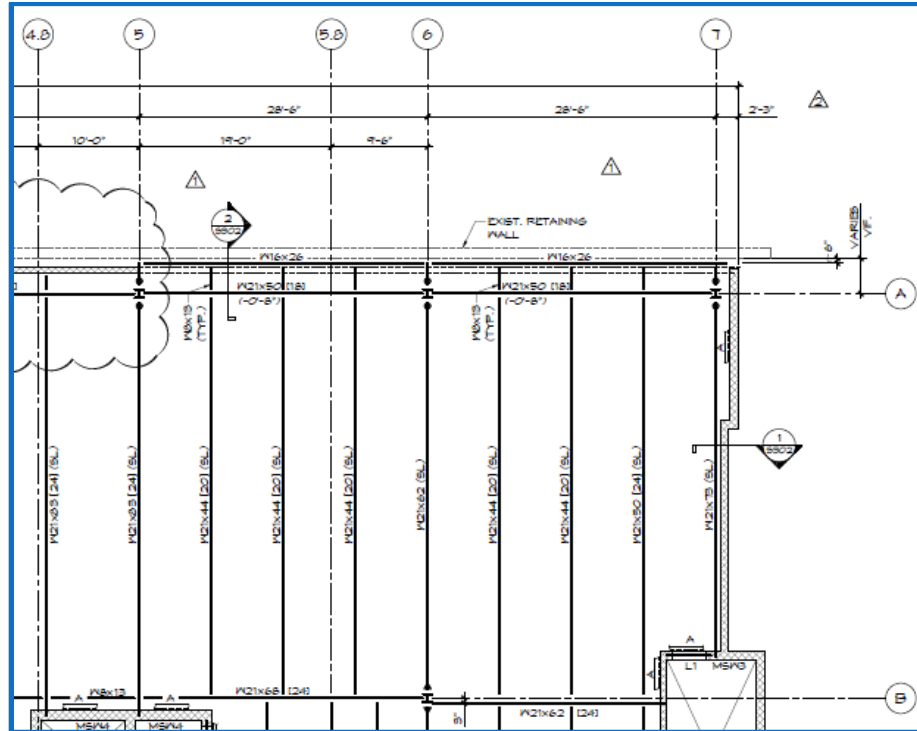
Close Up of North-East Corner of Steel Framing Plan
